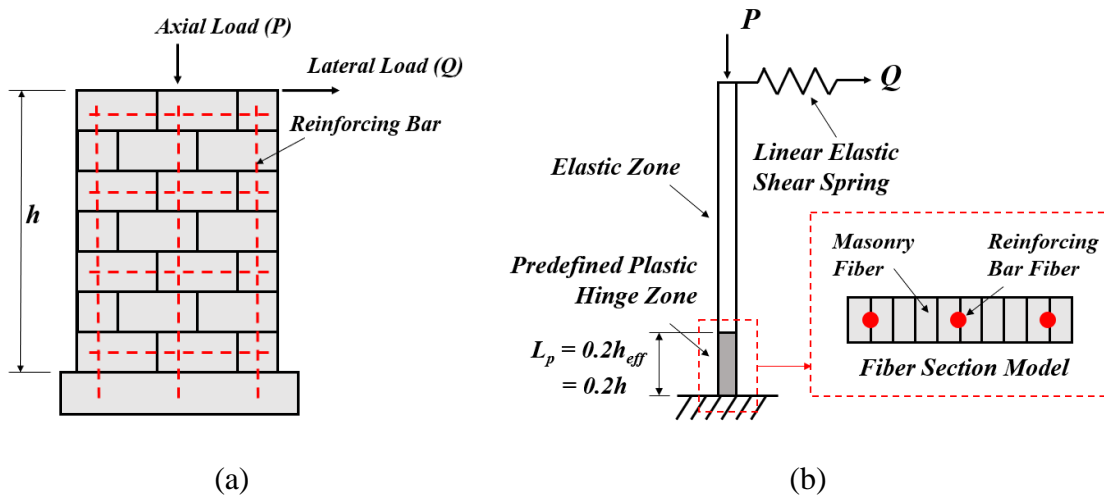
(a) Cantilever reinforced masonry wall; (b) Beam-column model with a shear spring
